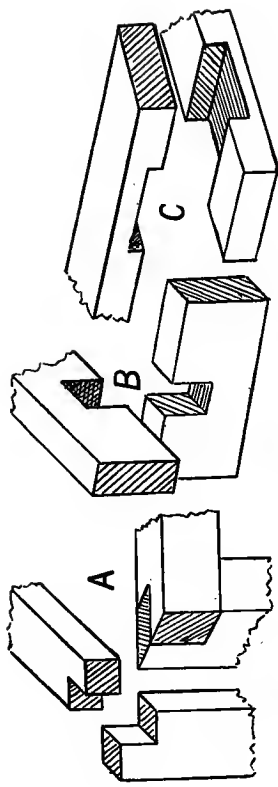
JOINTS USED IN THE MAKING OF POULTRY HOUSES
